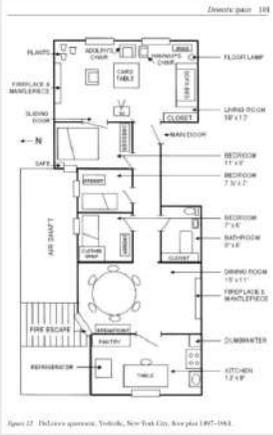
DeLano apartment, New York City, floor plan 1907-1963.
